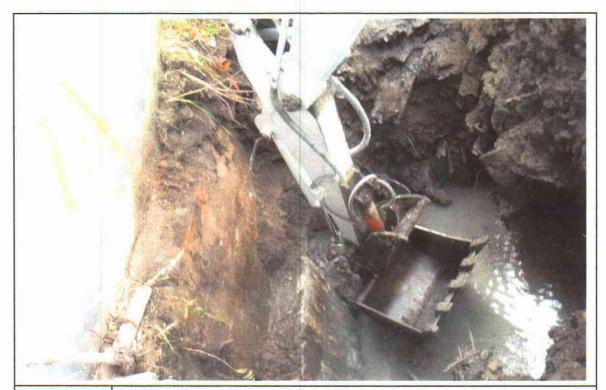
South Wall Excavation at Pier 24: Note loose fill in excavation.
